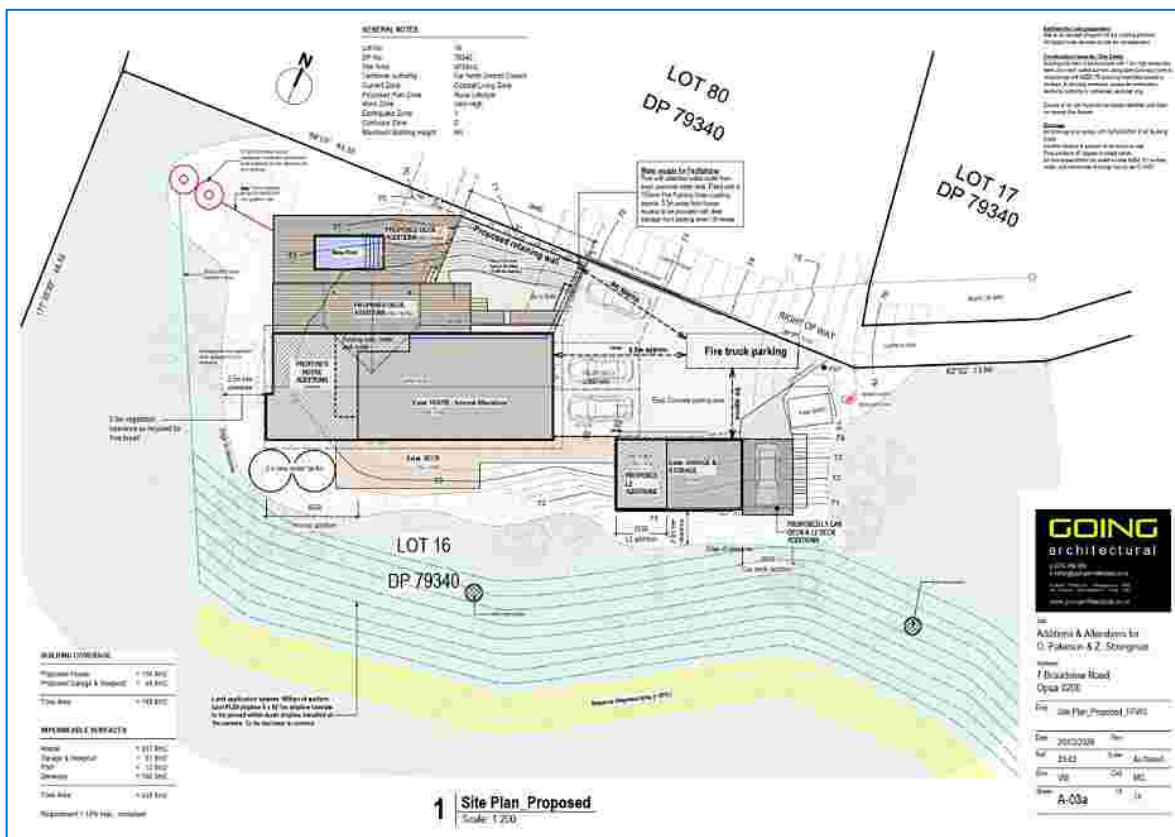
Proposed Site Plan with Fire Fighting Water Supply Detail
